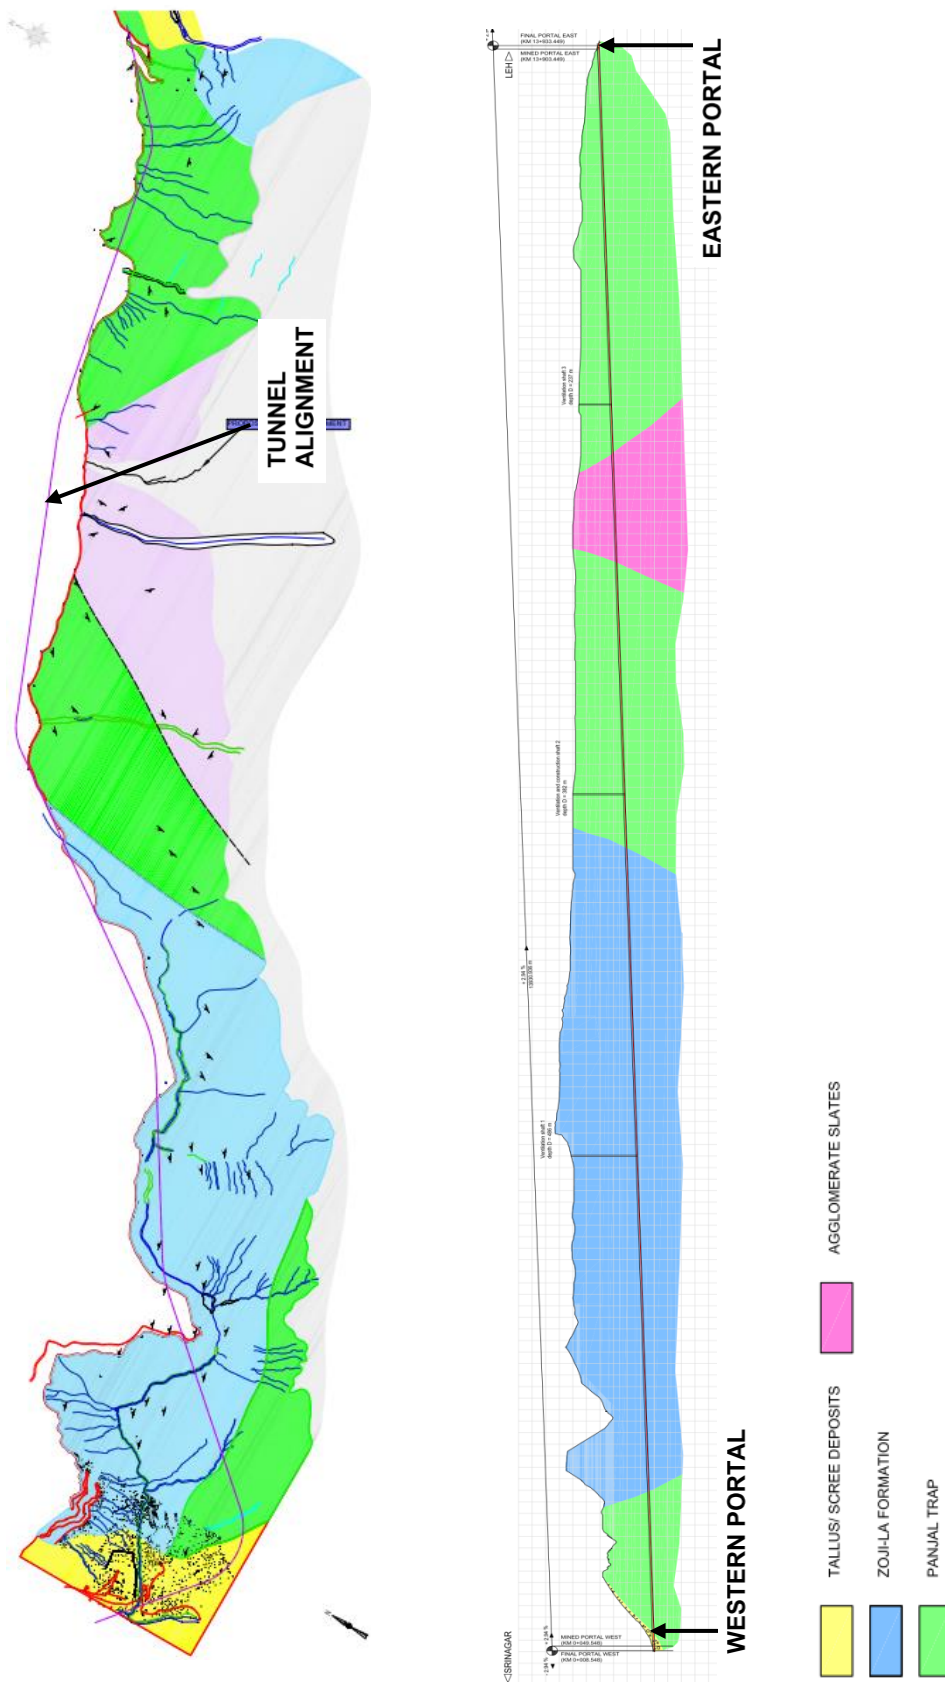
Left: Geological map of Zojila tunnel from [P2], modified (actual tunnel alignment); Right: Geological longitudinal section of Zojila tunnel from [P12]
